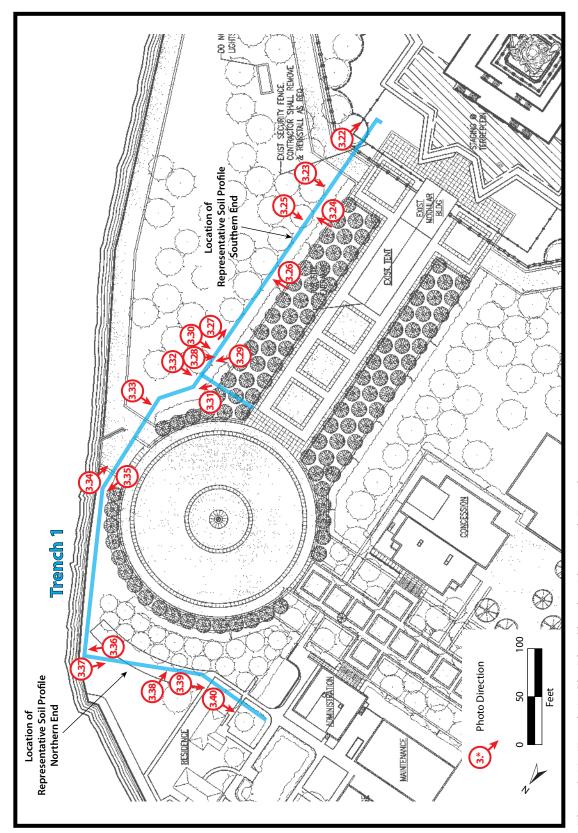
Trench 1: Site Plan Showing Photograph Locations.
